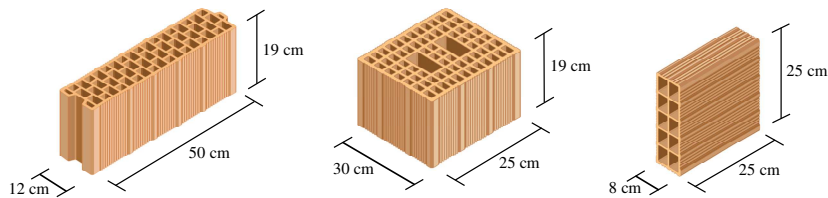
Bricks used for the infill masonry walls in Building 2.
